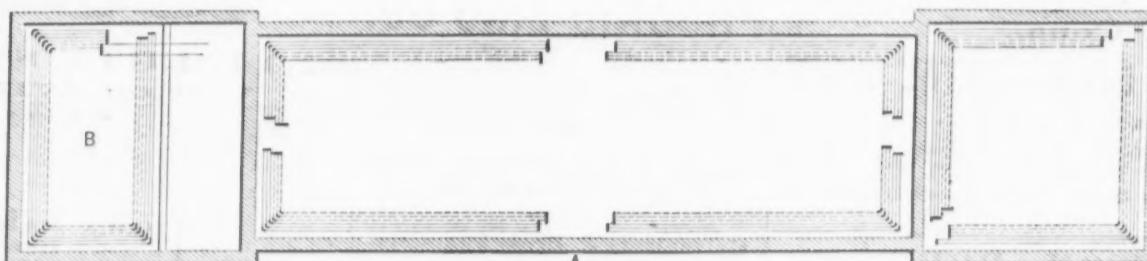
Plan of Piping, First Floor, West Front of Building.
